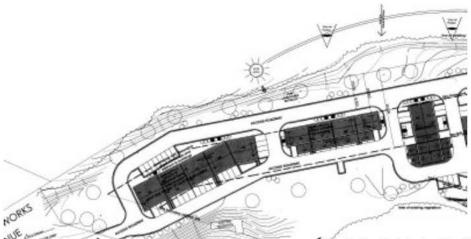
Plan approved by the LEC (Source: Plans prepared by Gelder Architects, dated 18 December 2012)
